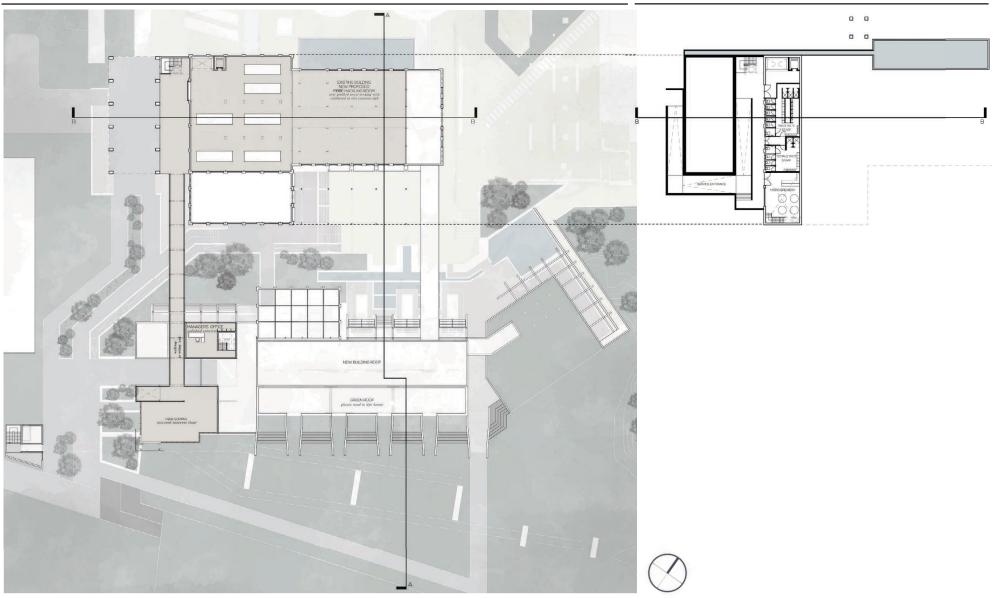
Final design Second & Basement Floor Plan (Author 2017)
